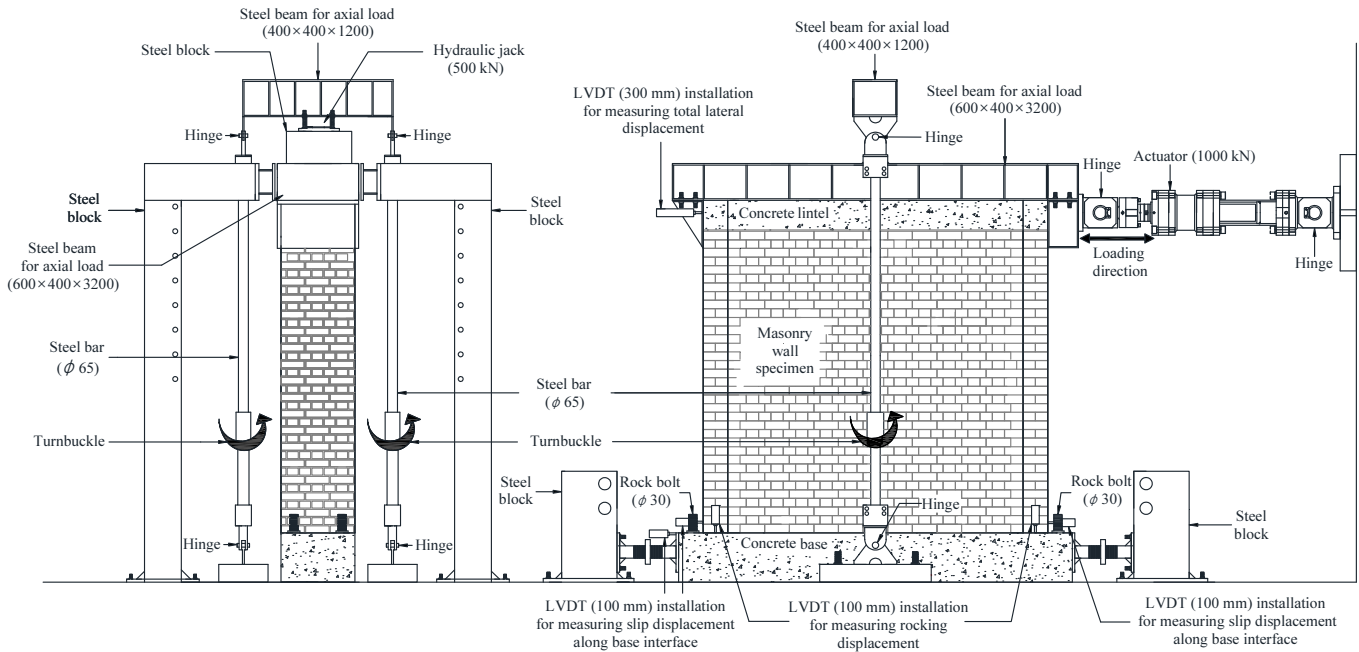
Test set-up of masonry wall specimens. (all dimensions are in mm)
